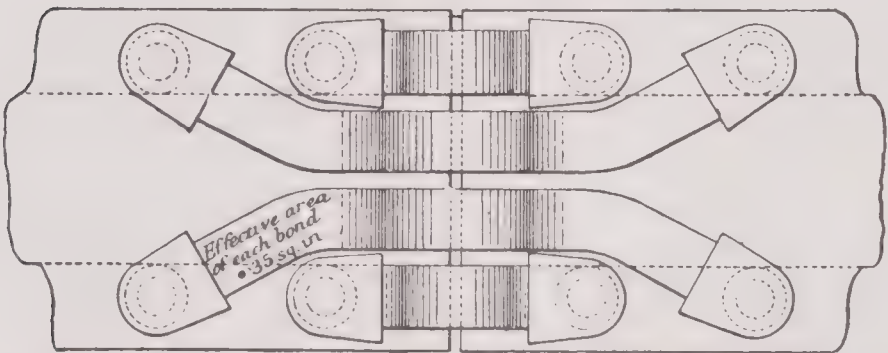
PROTECTED TYPE OF BONDS ON LONDON UNDERGROUND ELECTRIC RAILWAYS.
